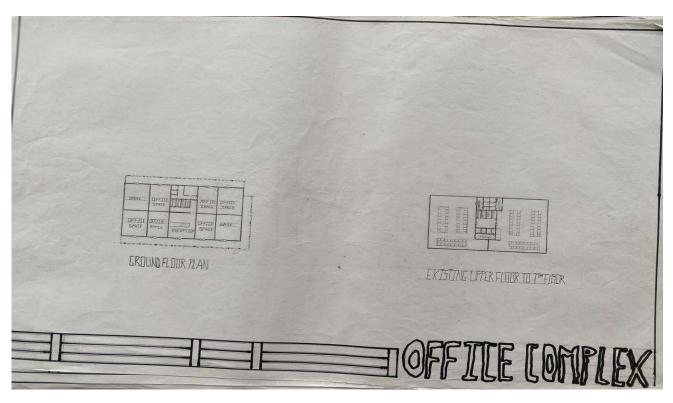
SHOWING THE GROUND FLOOR AND UPPER FLOOR PLAN OF CASE STUDY ONE
